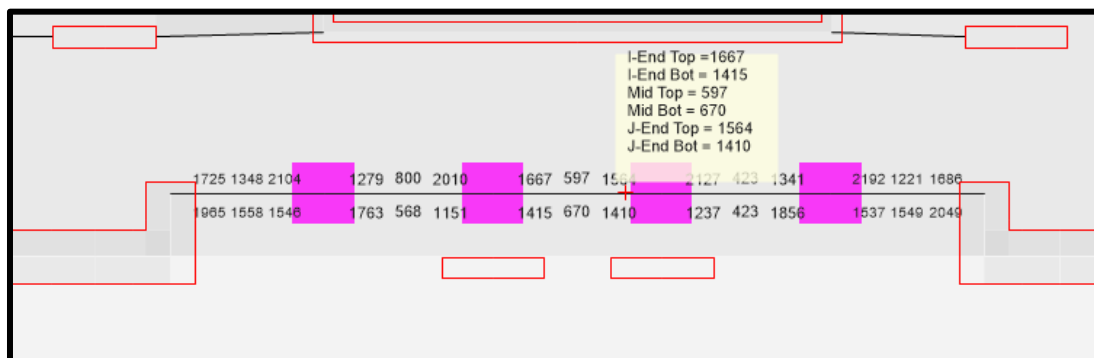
Interior Beam Flexural Longitudinal
